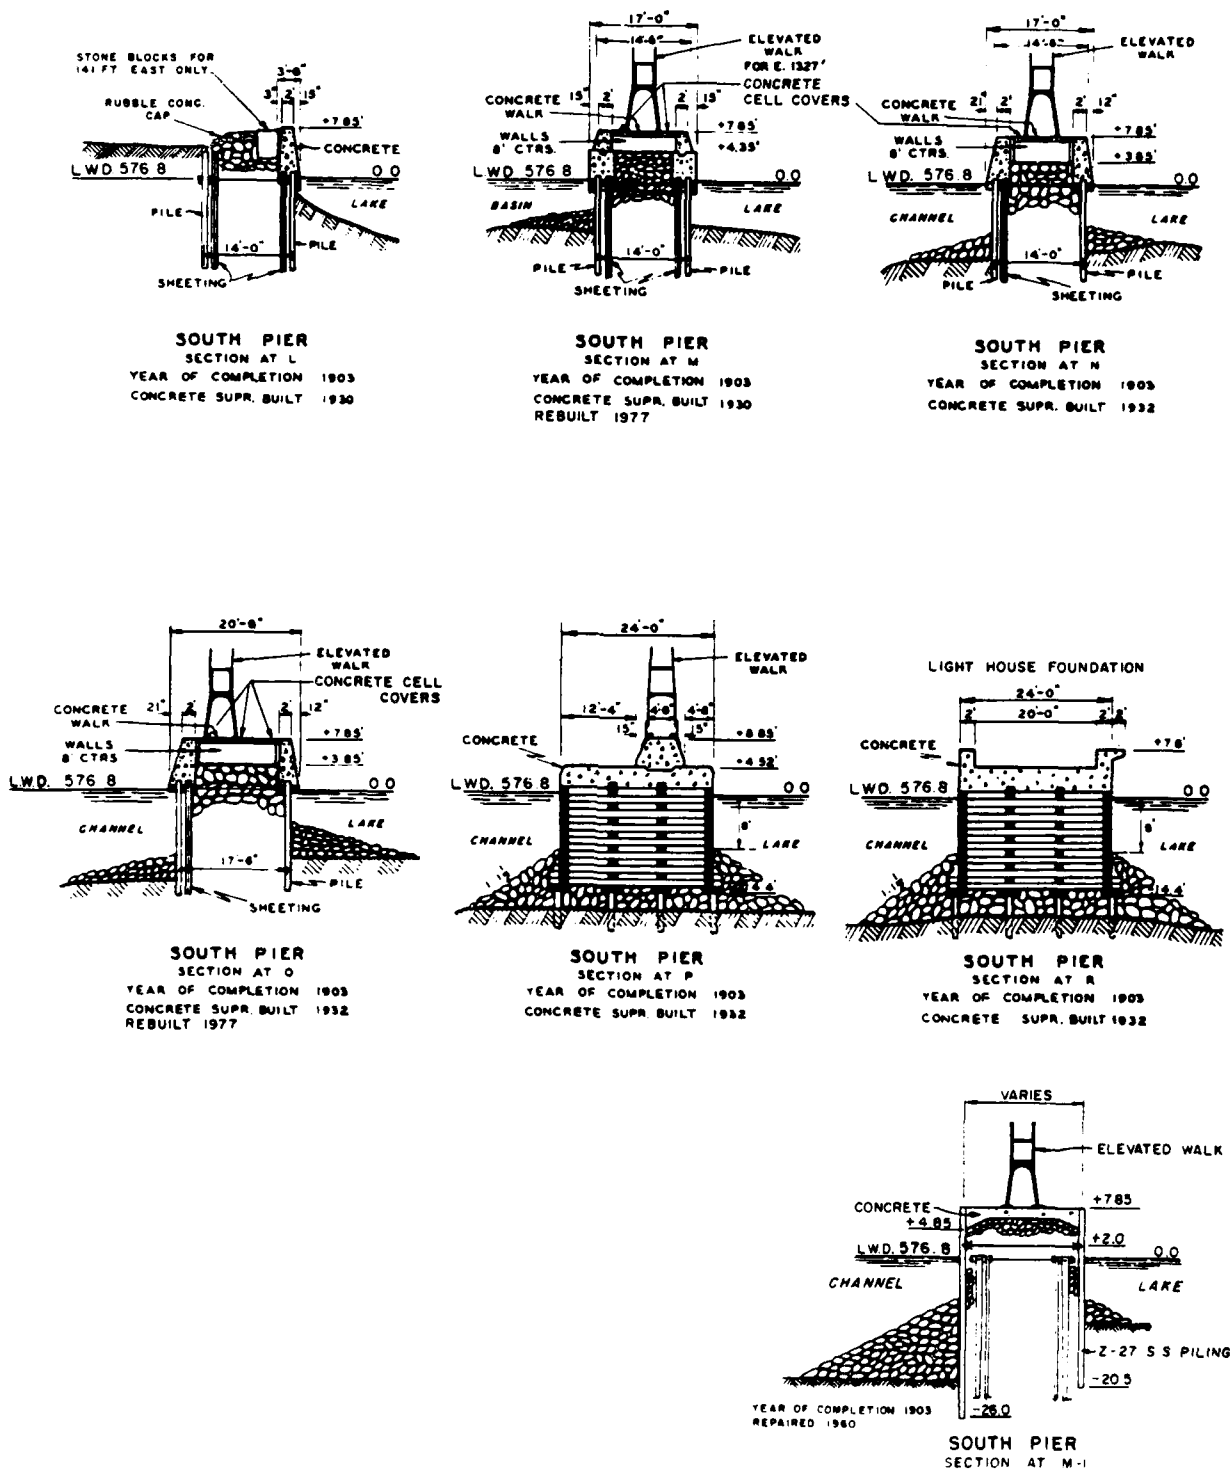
Typical pier cross sections, Waukegan Harbor, Illinois
